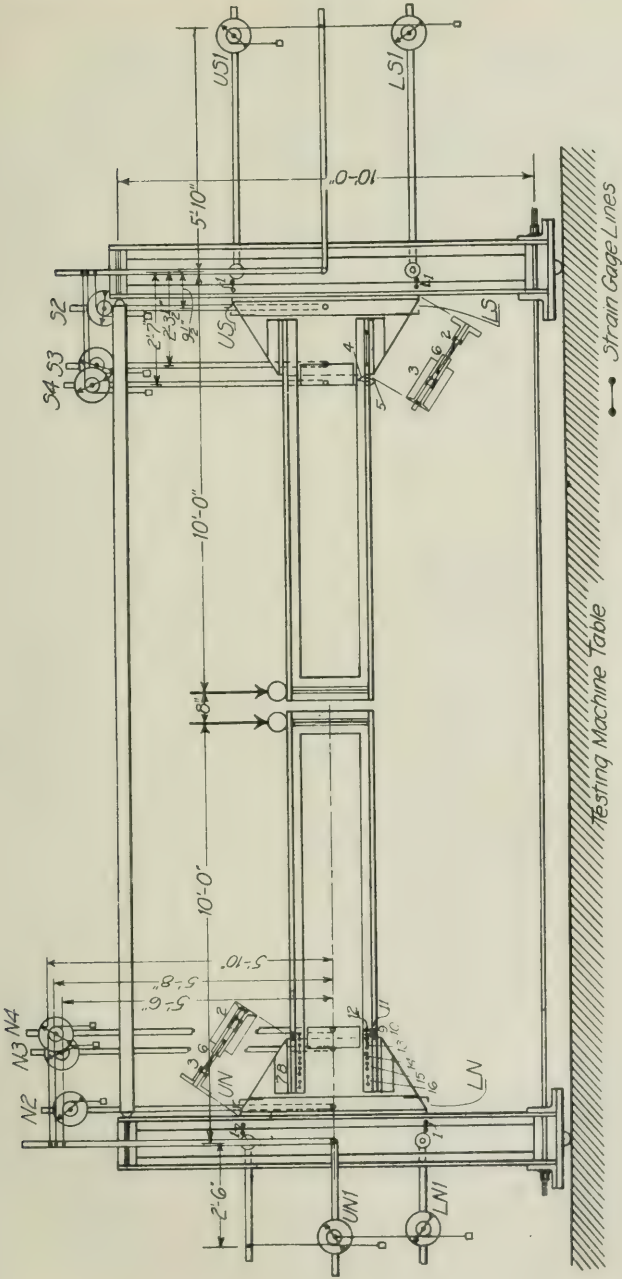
MEASUREMENTS OF ROTATION FOR TEST PIECES A2
